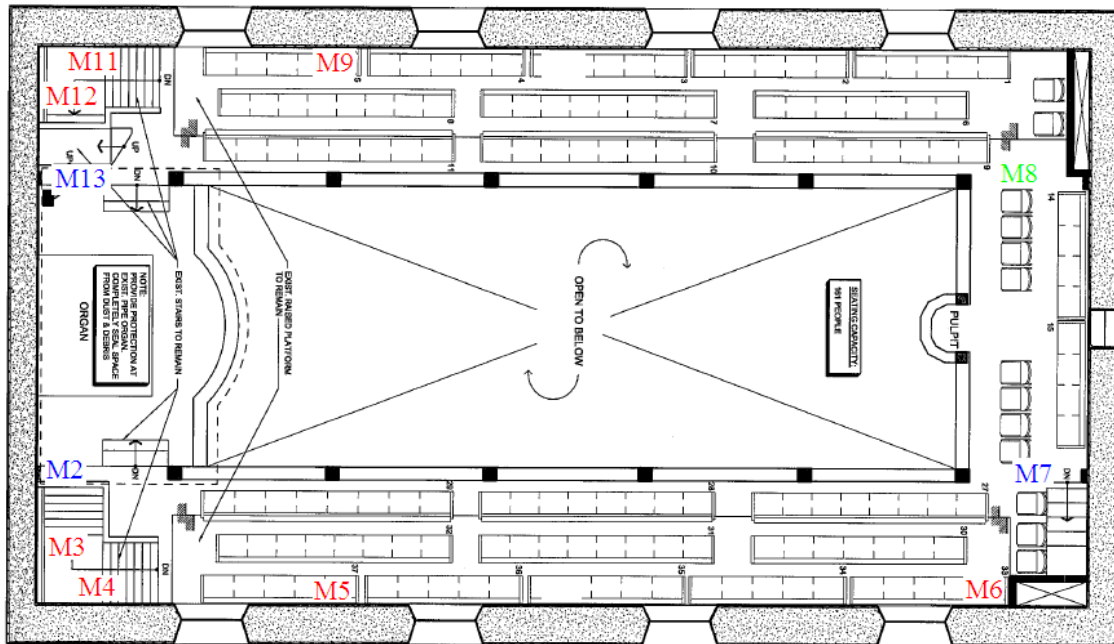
Plan view of St. Paul Lutheran with mote placement
